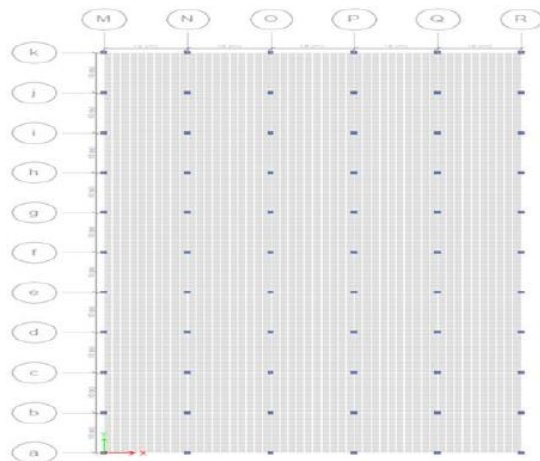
The two dimensional plan view of the concrete frame building in Etabs model
